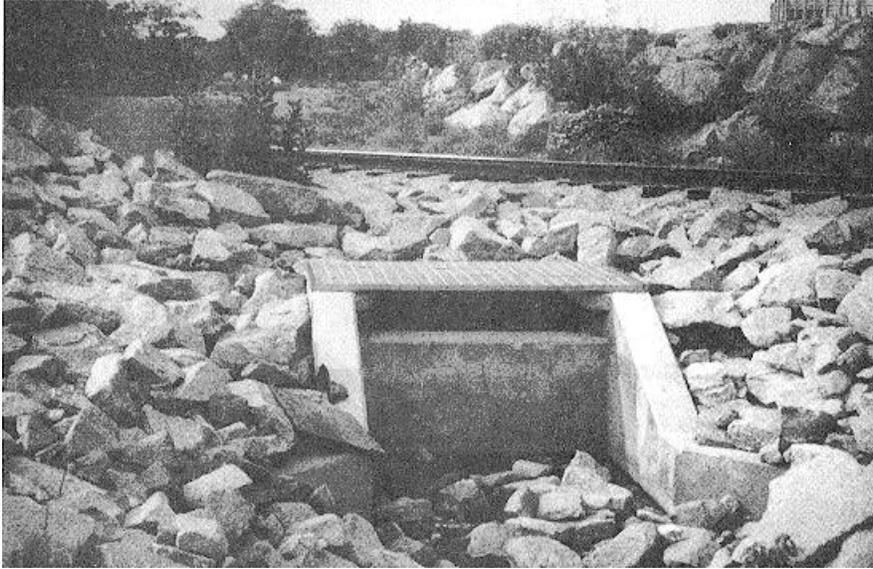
Headwall at inlet to culvert passing beneath a railroad bed.
